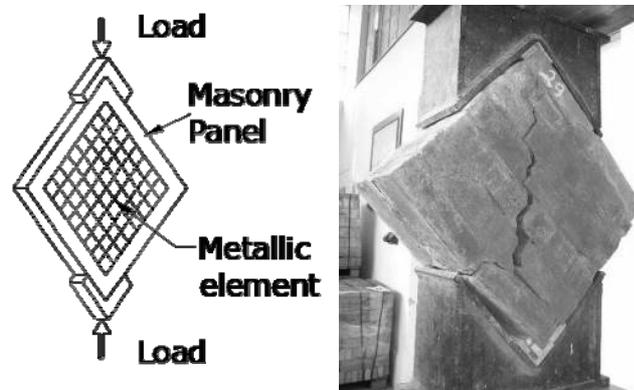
Testing set-up for diagonal tensile test and reference specimen failure mode.
